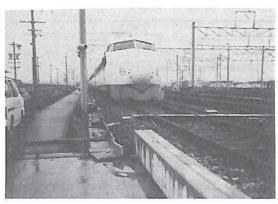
View of the bridge supported by the GRS-RW bridge abutments at Hibitsu, Nagoya
